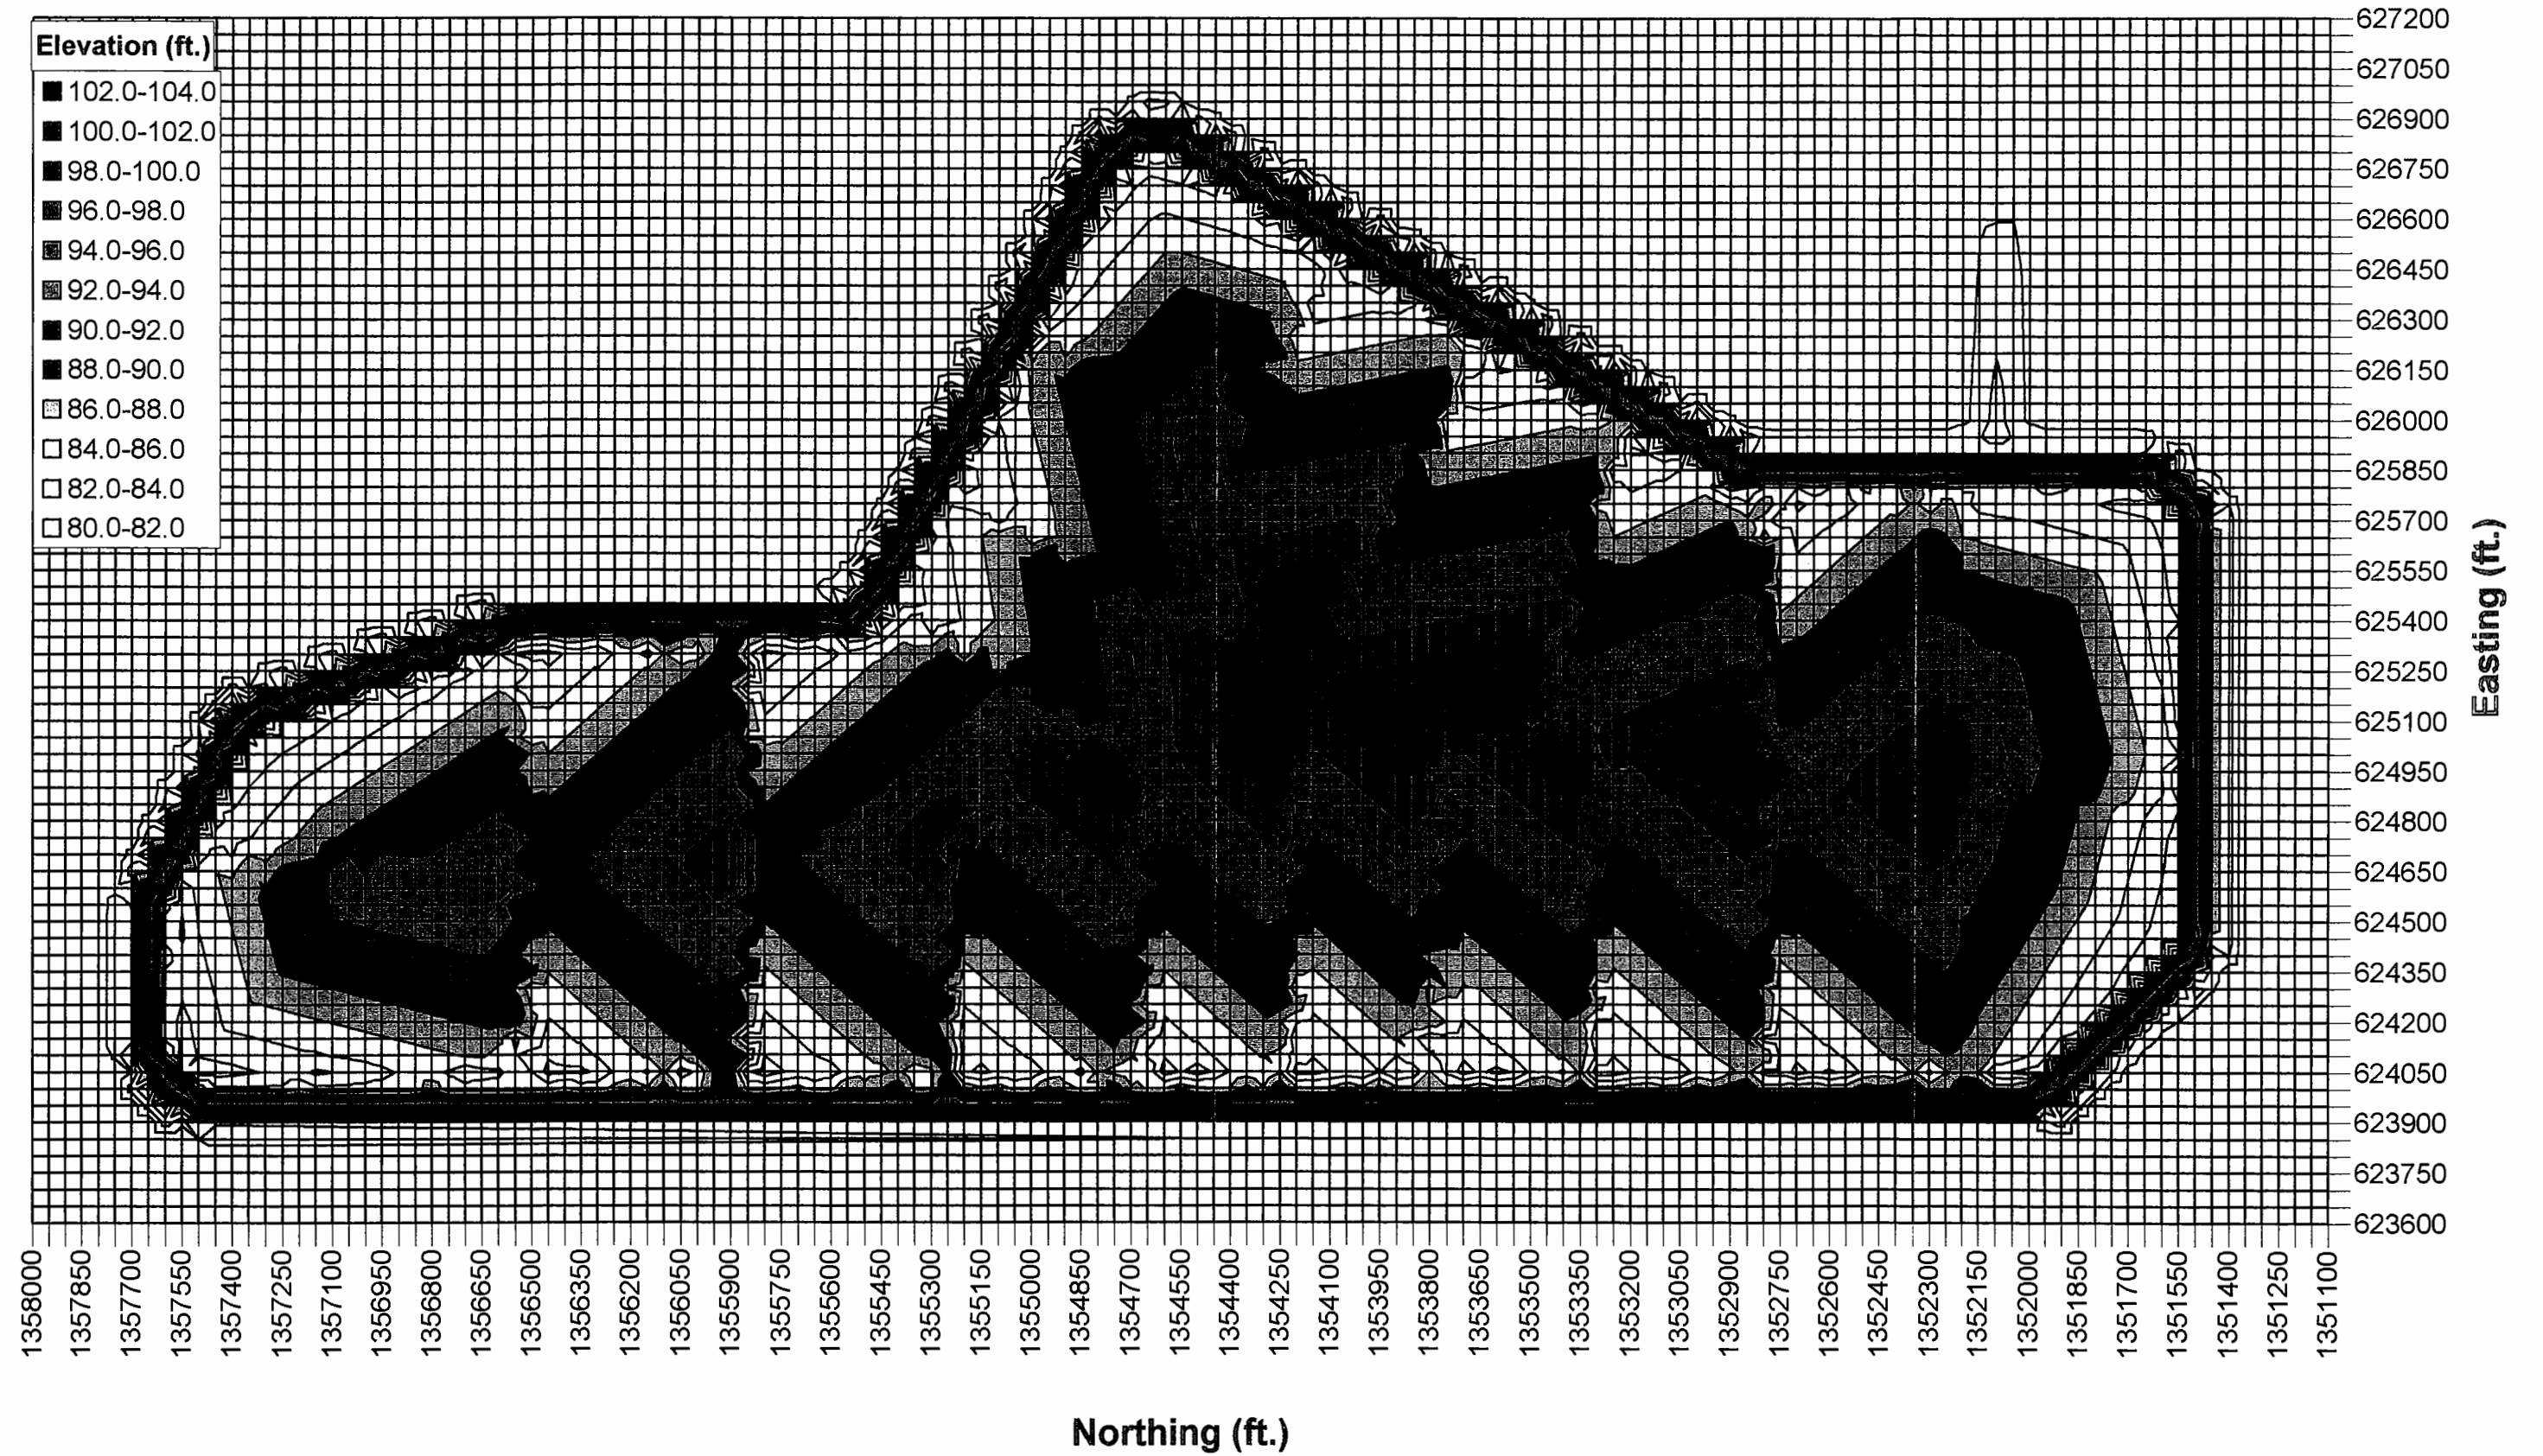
Sub-Grade Elevations: Pre-Settlement.
